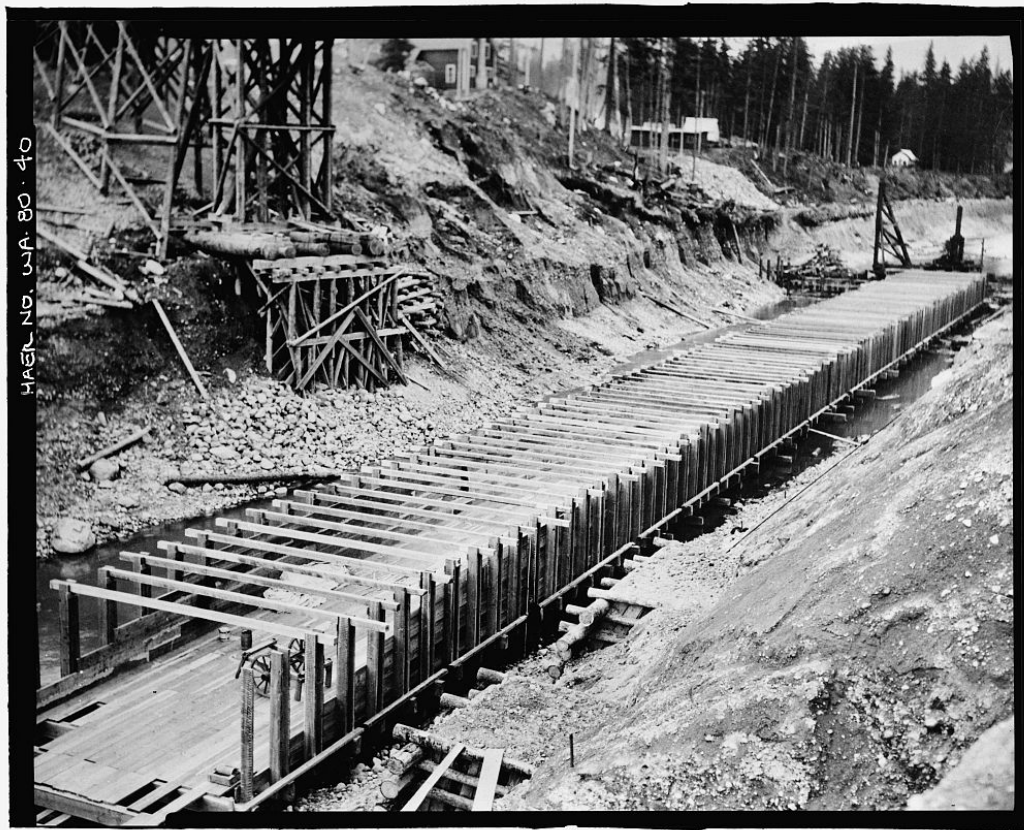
Keechelus Dam Construction, October 1913.
